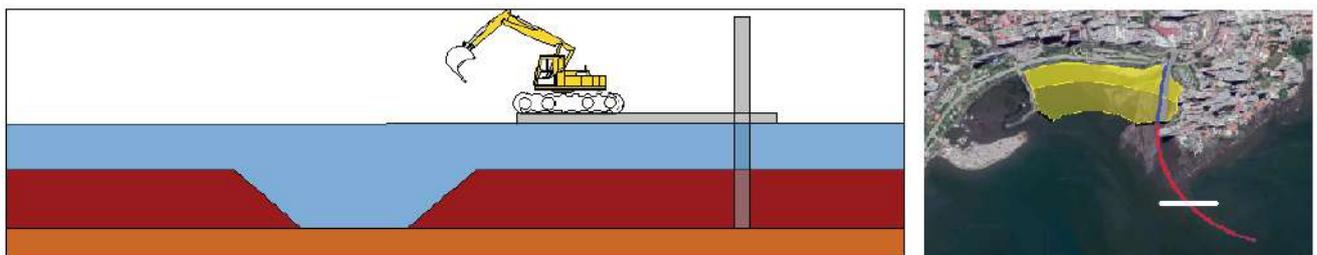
Phase 8: Trench dredging remaining outfall section
